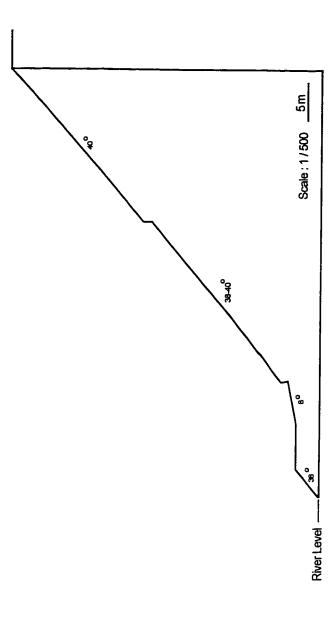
Longitudinal Profile, P-22, at Loc. 22, (looking downstream)
